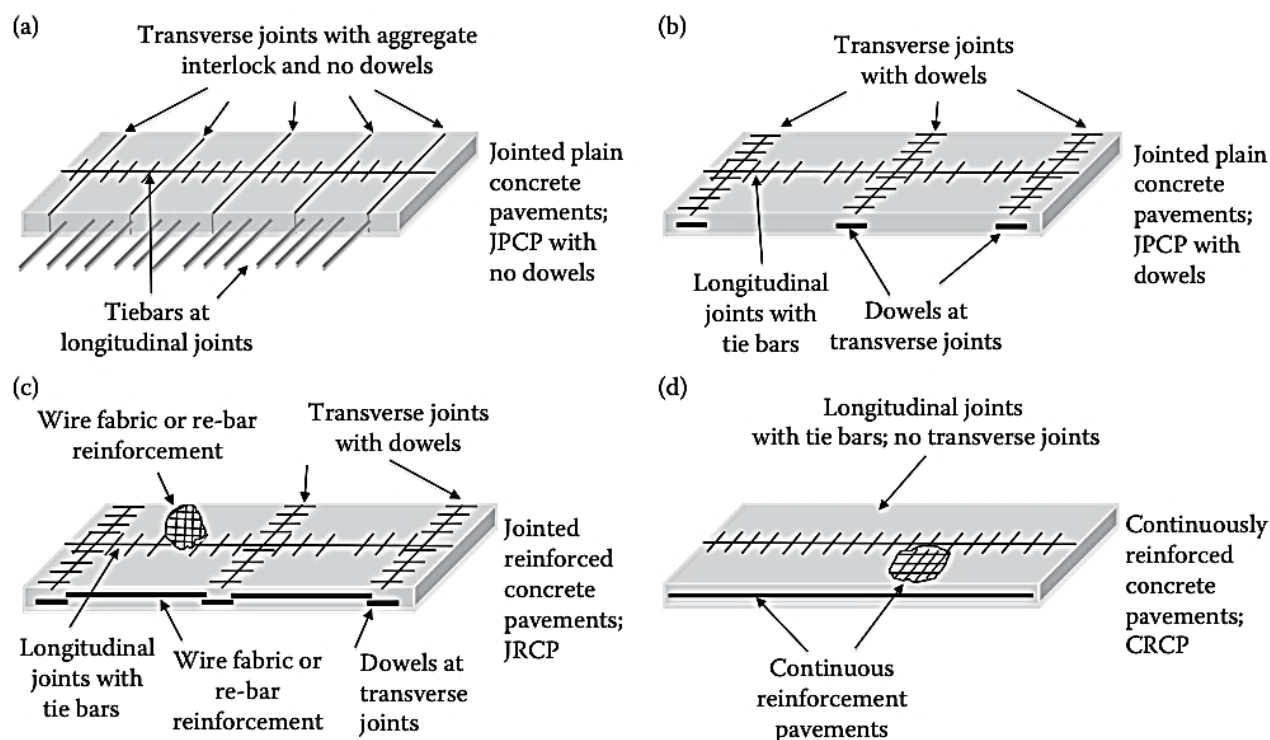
Jointed plain concrete pavement (JPCP) with tie bars and (a) no dowels, (b) with dowels, (c) jointed reinforced concrete pavements (JRCP) with tie bars and dowels, and (d) continuously reinforced concrete pavements (CRCP) (from Mallick and El-Korchi 2011)
